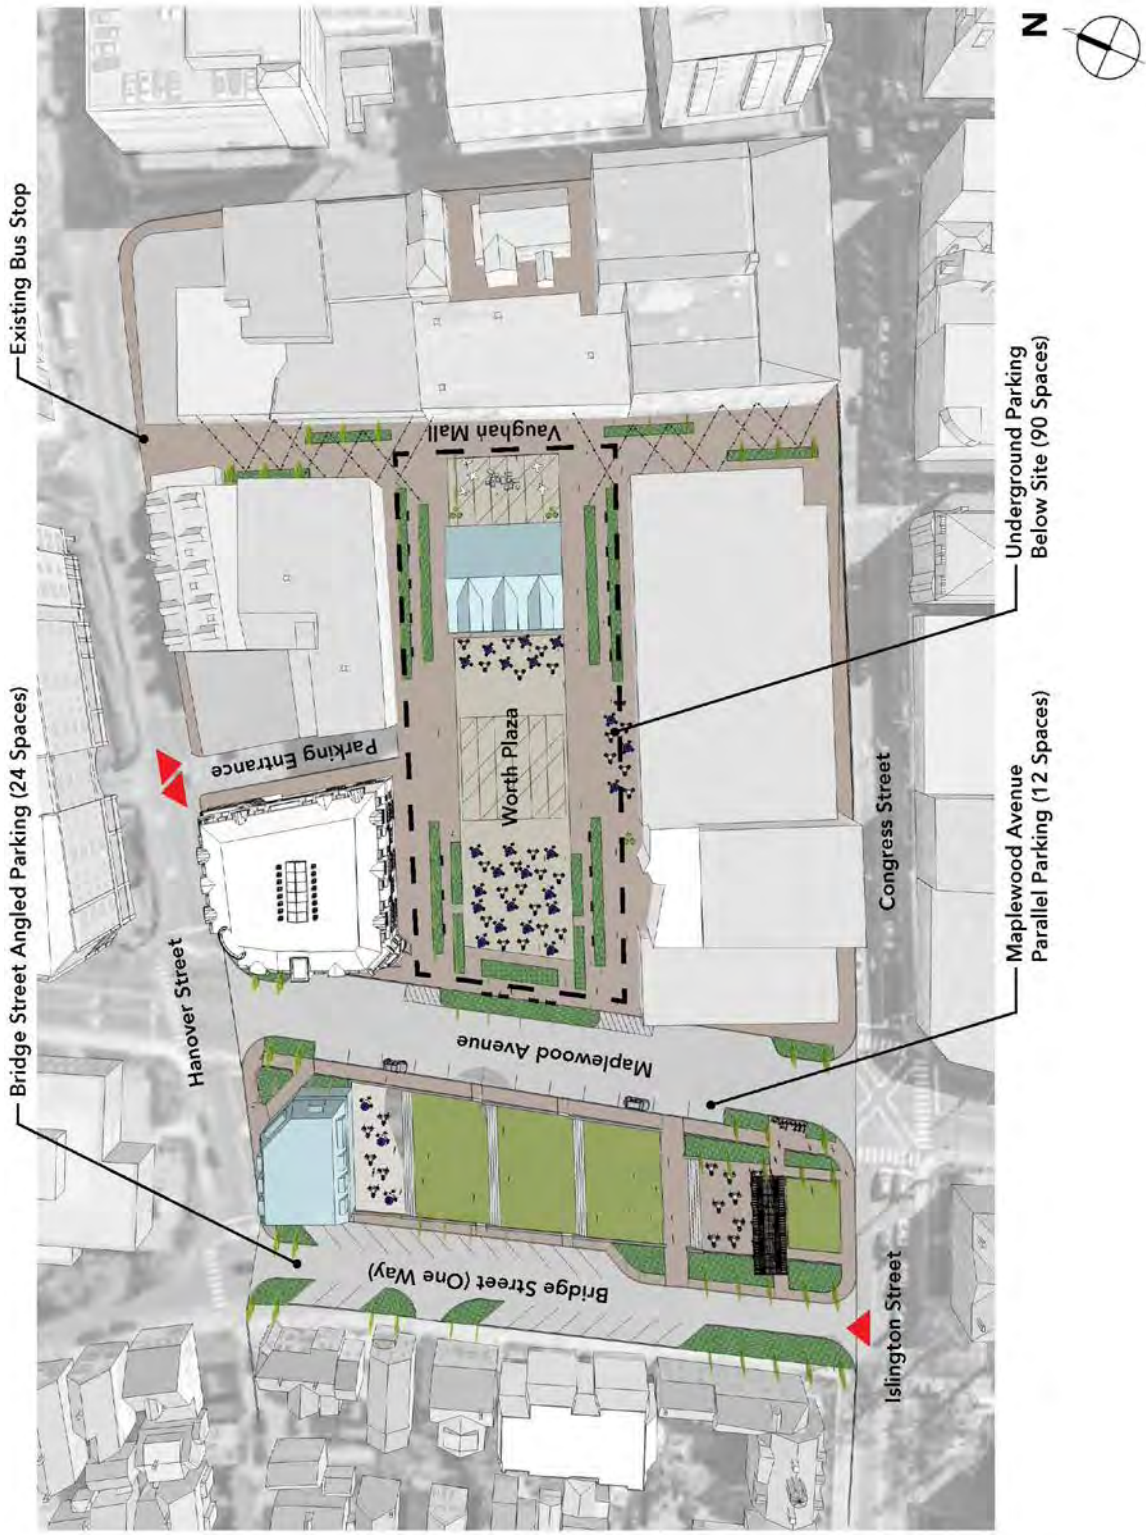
The vision provides parking accommodations for local businesses in the context of a larger Portsmouth parking plan. The plan envisions underground parking beneath the Worth lot open space to and from Hanover Street, on-street parallel parking on Maplewood Avenue and angled parking on Bridge Street for a total of 126 spaces.
